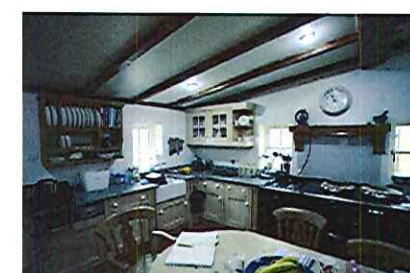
Internal view of kitchen extension - proposed to be removed / replaced. Image shows low roof pitch and eaves height.
